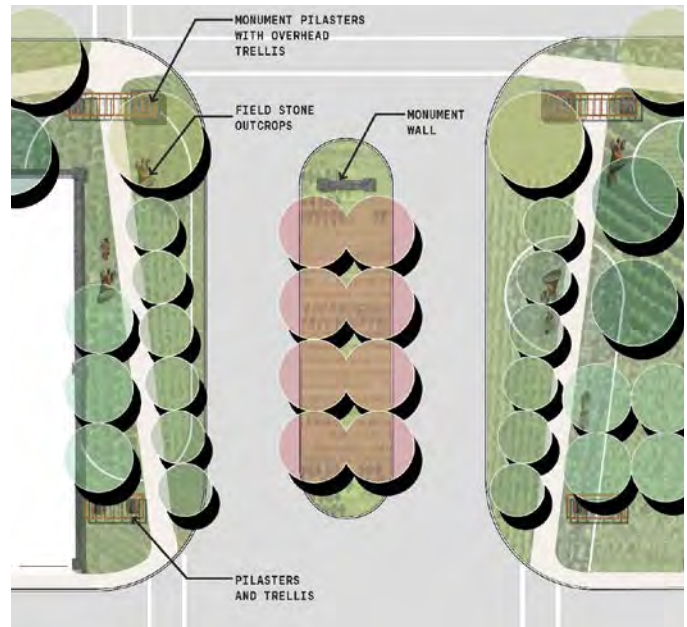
Conceptual Entry Plan - Woodward Avenue
